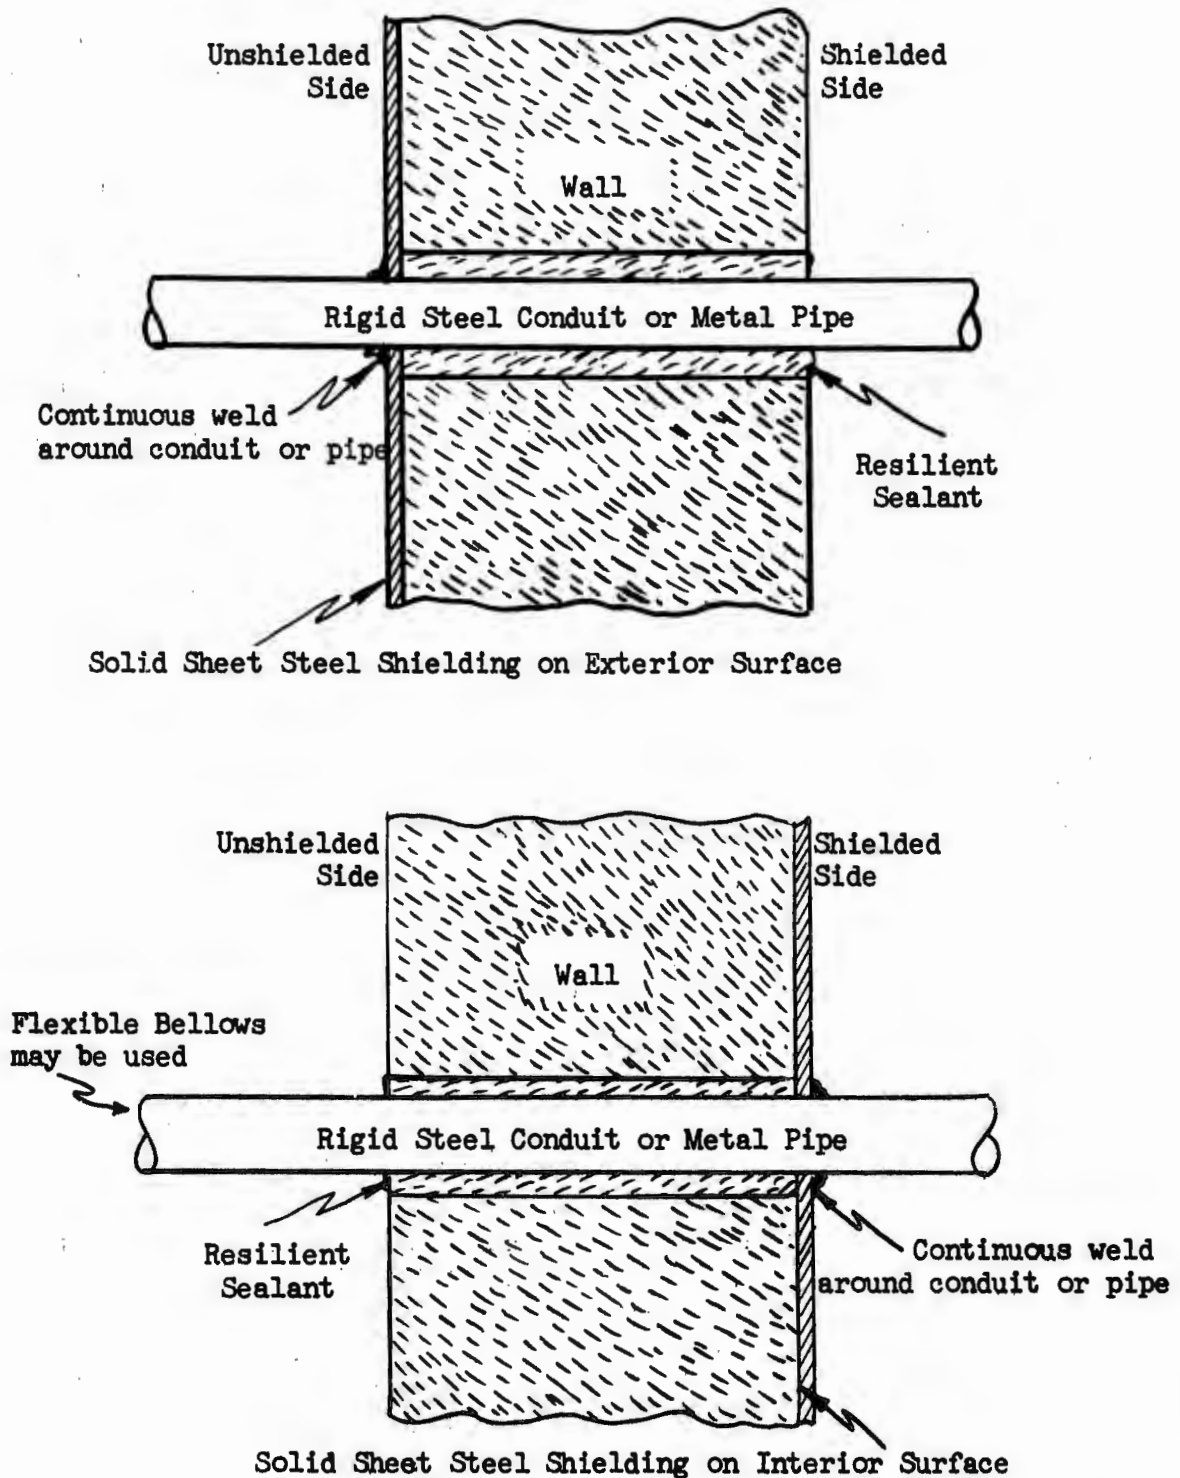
Outside Wall Penetrations with Solid Sheet Steel Shielding
